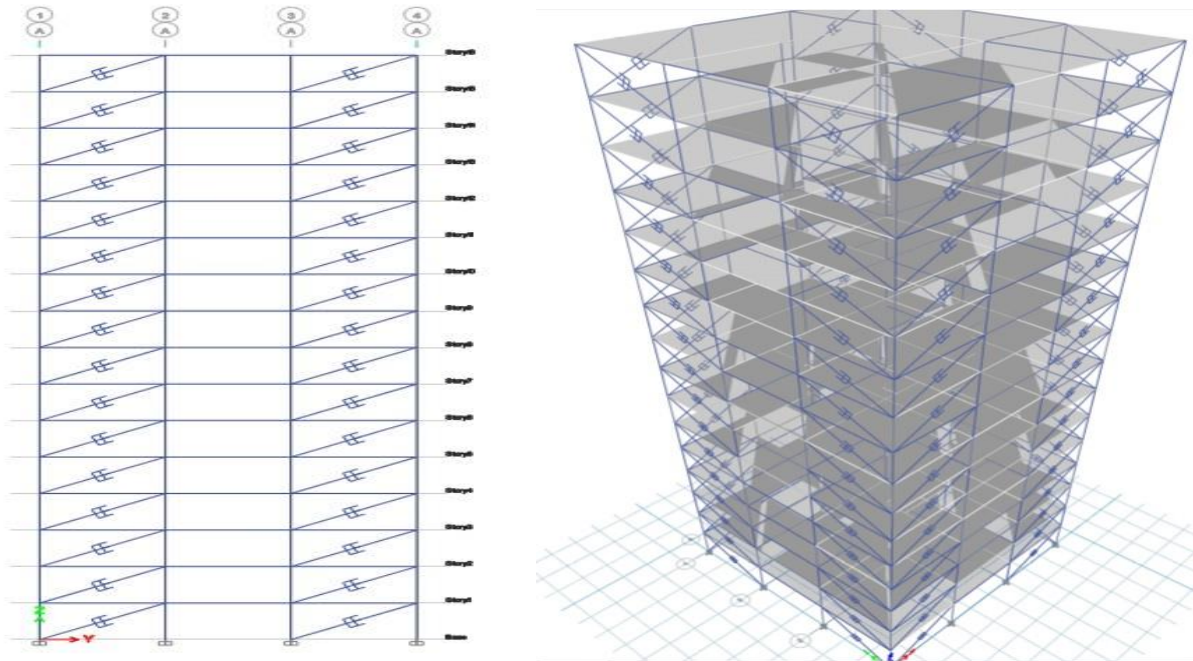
Elevation & Isometric view of G+15 Building with FVD
